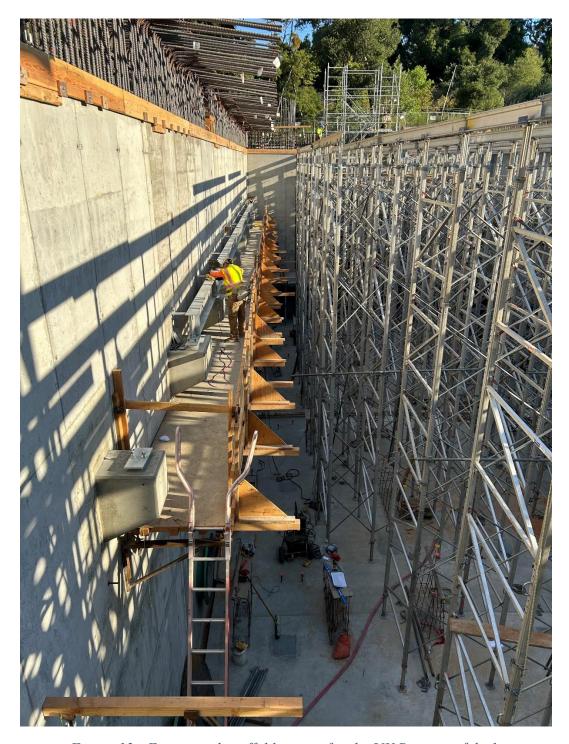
Engineered scaffold towers for the UV Room roof deck.
